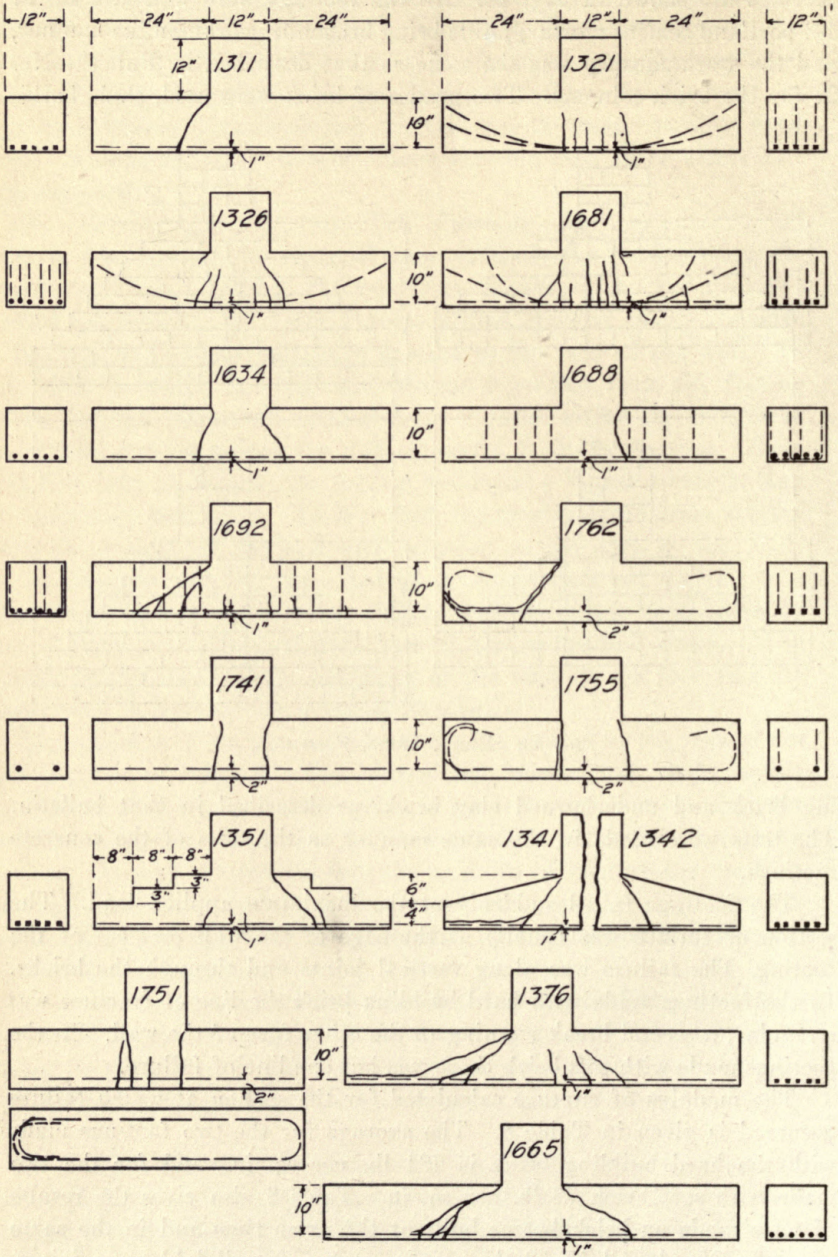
REINFORCED CONCRETE WALL FOOTINGS.
